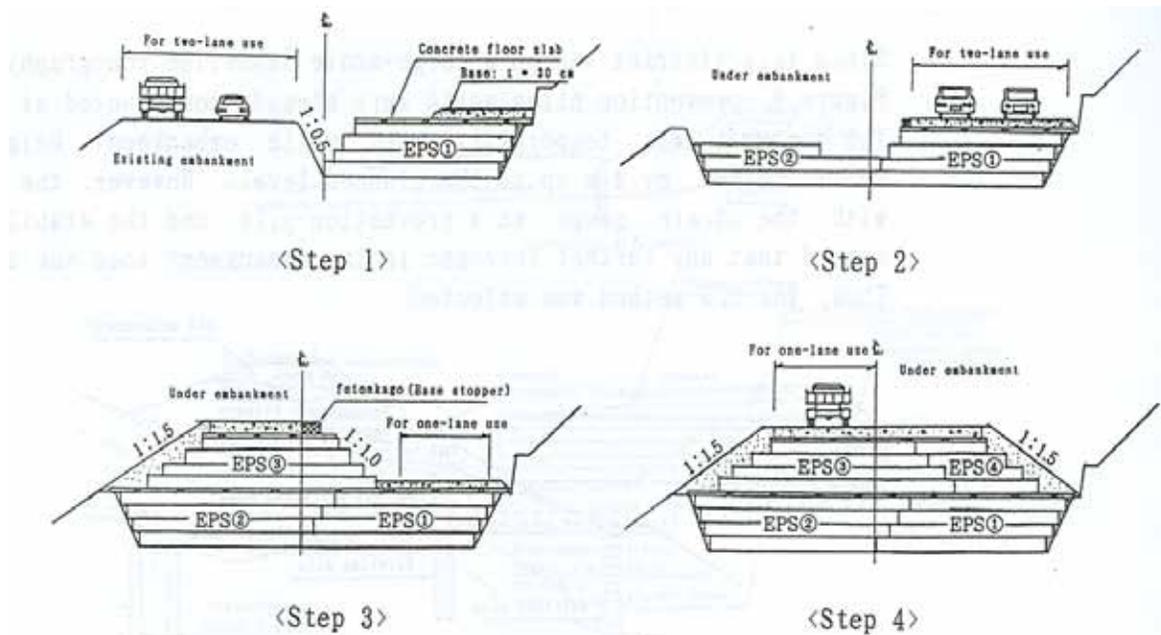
Cross-section view of potential method for phased construction of EPS-block gefoam roadway embankment fills (Tsukamoto, 1996).
